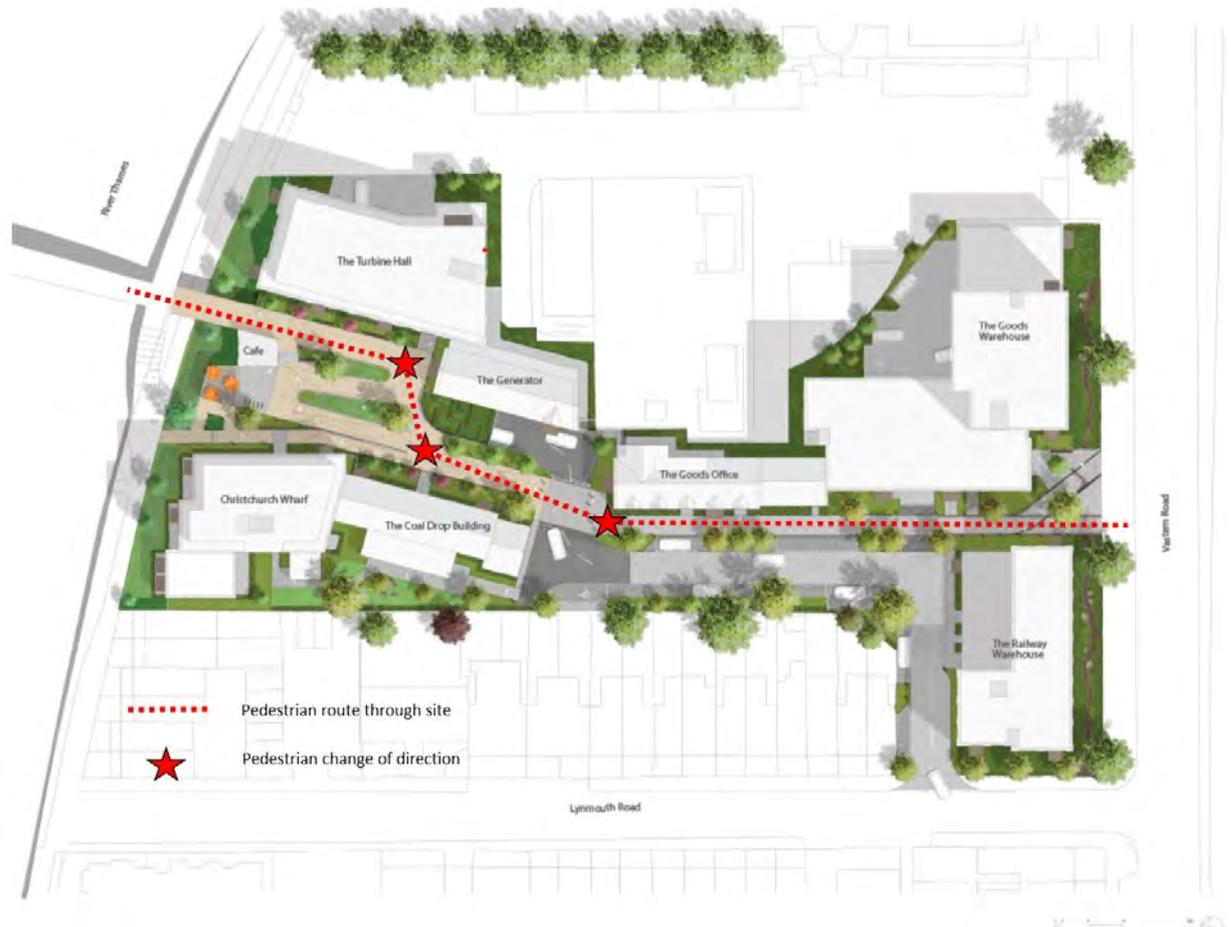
Blank site plan showing the most direct pedestrian route through the site
